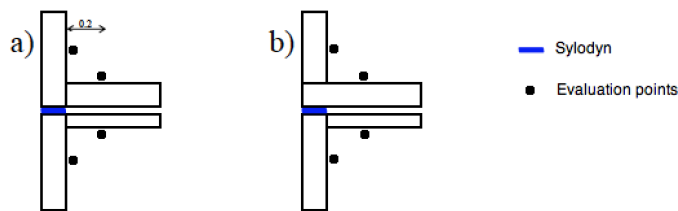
Different Sylodyn positions: (a) floor and ceiling installed between the walls and (b) floor installed upon walls. The evaluation points are dots in the figure (6 evaluation points along each line are considered).
